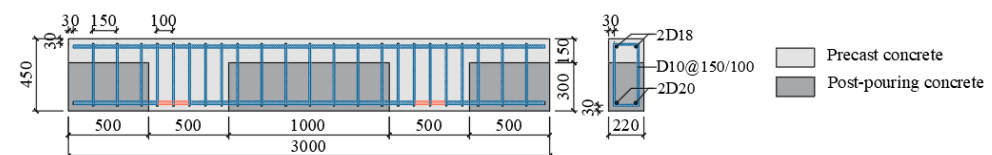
The details of the concrete and reinforcement for the PC beam: side view (unit: mm).
